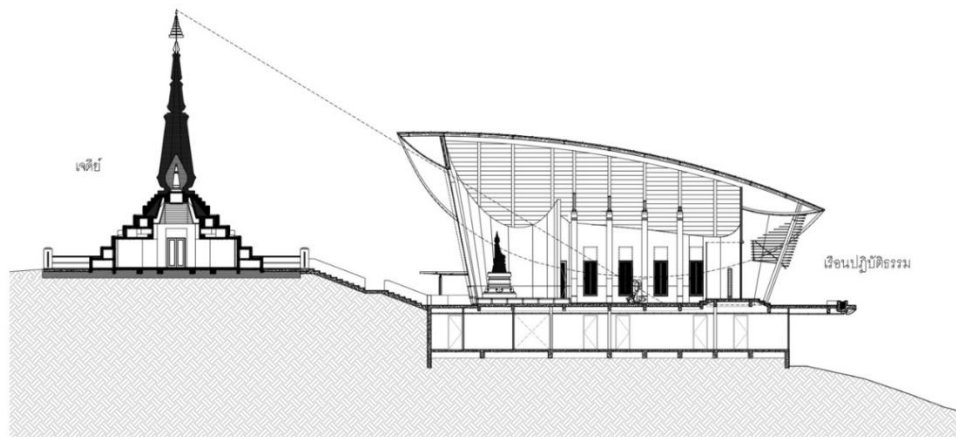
Site Plan of Sasi Pawan Wisdom Center
